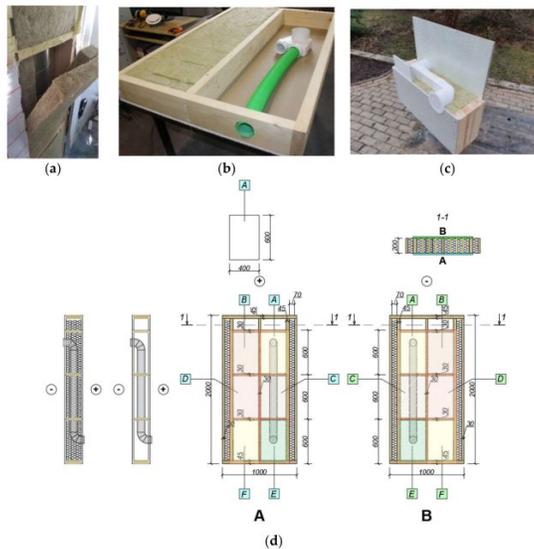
Wooded frame test construction: (a) steel duct; (b) flexible plastic duct; (c) plastic ducts; (d) test wall dimensions.
